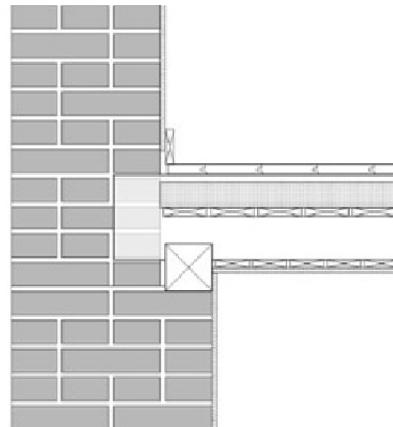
Vertical section of the joint between the exterior loadbearing wall, which is the facade, and the horizontal partition. The exterior wall is a solid brick wall that decreases in thickness by half a brick every two storeys. The timber beams reach into the brick wall.
